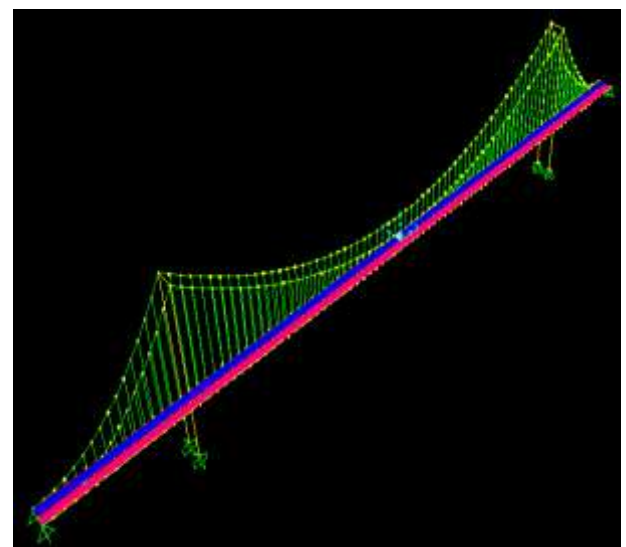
3D Picture of 600 m Suspension Bridge with 2 lane Road
